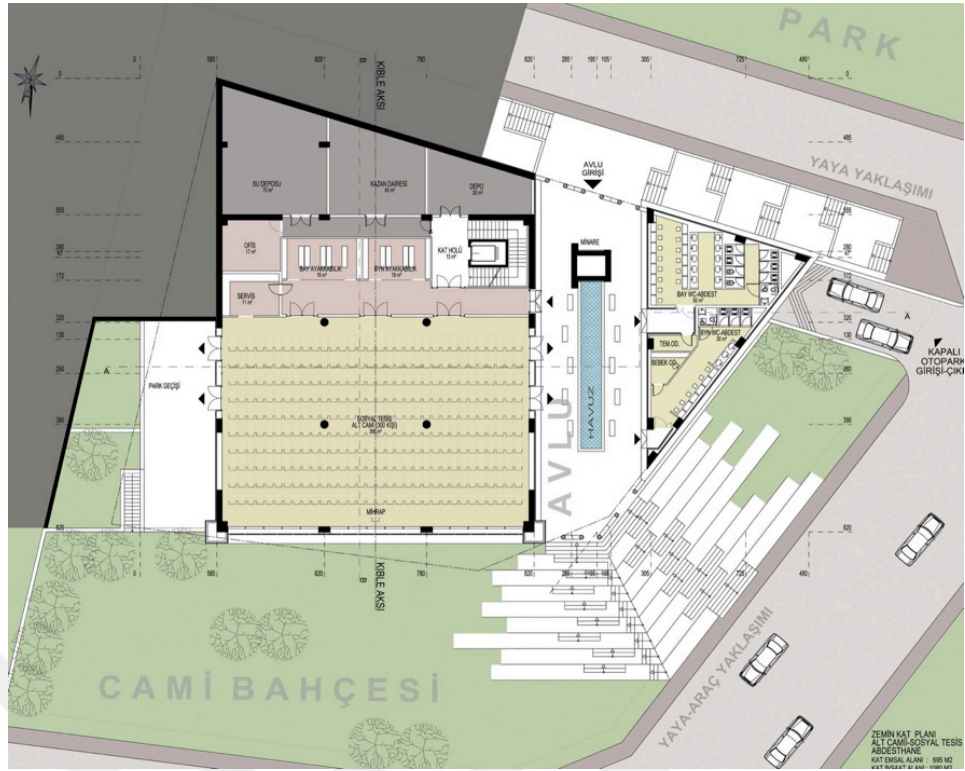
Uluyol Mosque Basement Floor Plan (Moza 2020)
